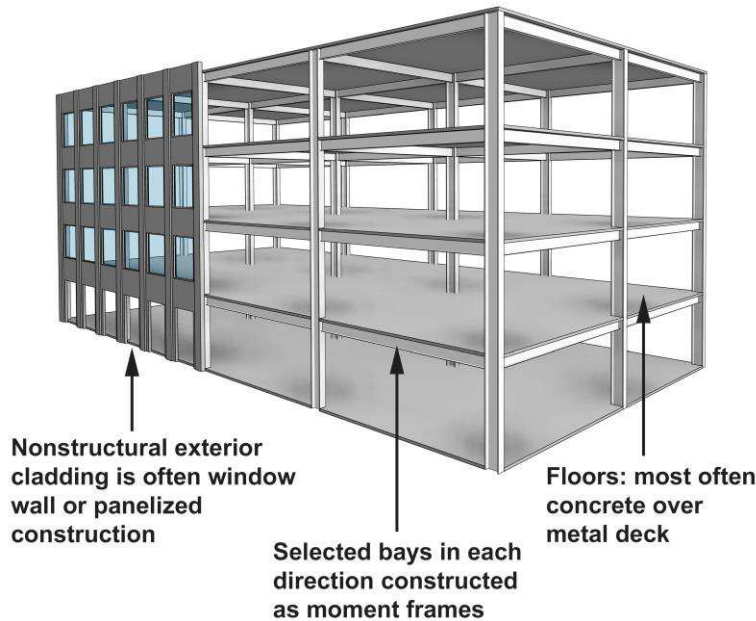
Schematic illustration of a SMF *building* (Figure adapted from FEMA 547, FEMA, 2006)
